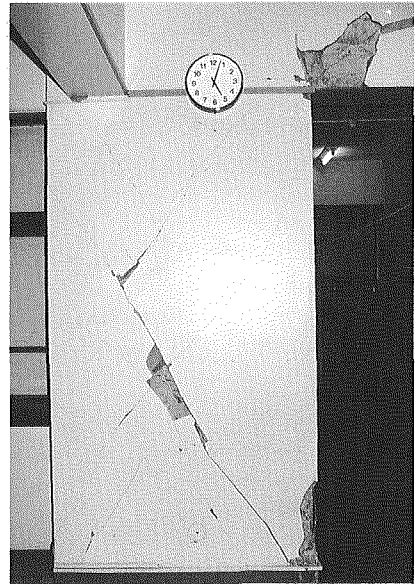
Shear failure of column with wall and shear failure of beam (Nakashibetsu Citizen's Hall)
